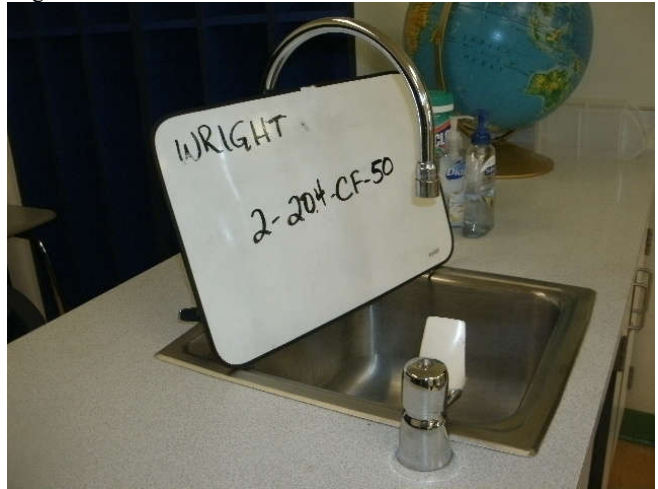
Classroom faucet w/bubbler, located on the 2nd floor, in room 204.
